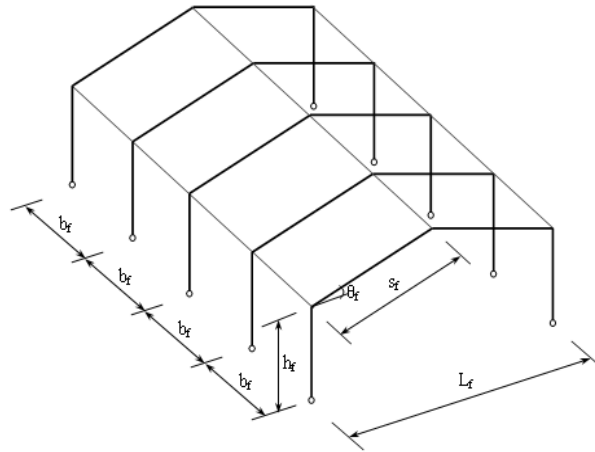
Parameters of topography of steel portal frame building (purlins, side rails and cladding not shown)
